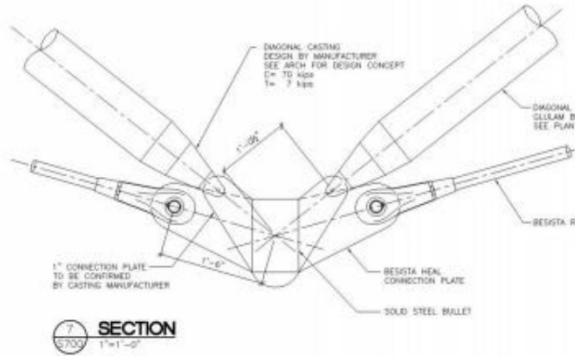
Leers Weinzapfel Associates, detail drawing of the truss connection, John W. Olver Design Building, Amherst, MA, 2017.⁵
